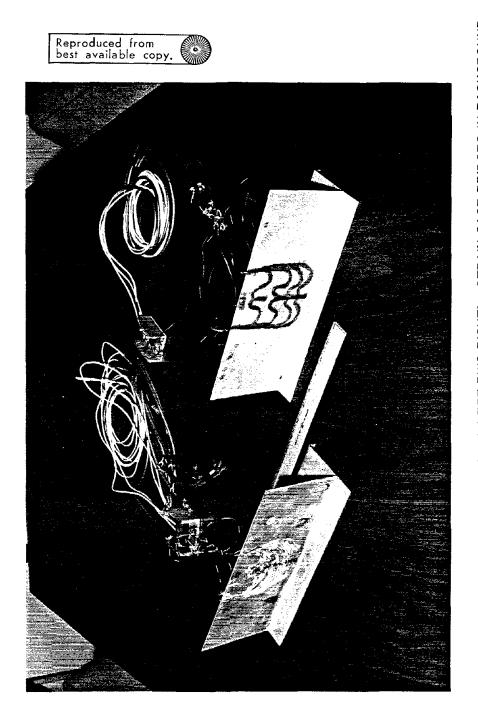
MODEL RETAINING WALLS (RW I, LEFT: RW2, RIGHT) STRAIN GAGE BRIDGES IN BACKGROUND
